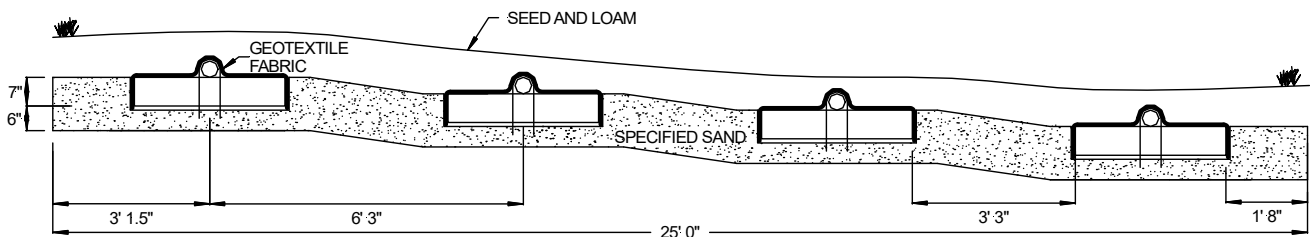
SECTION VIEW – BED SYSTEM EXAMPLE – SLOPING SITE
